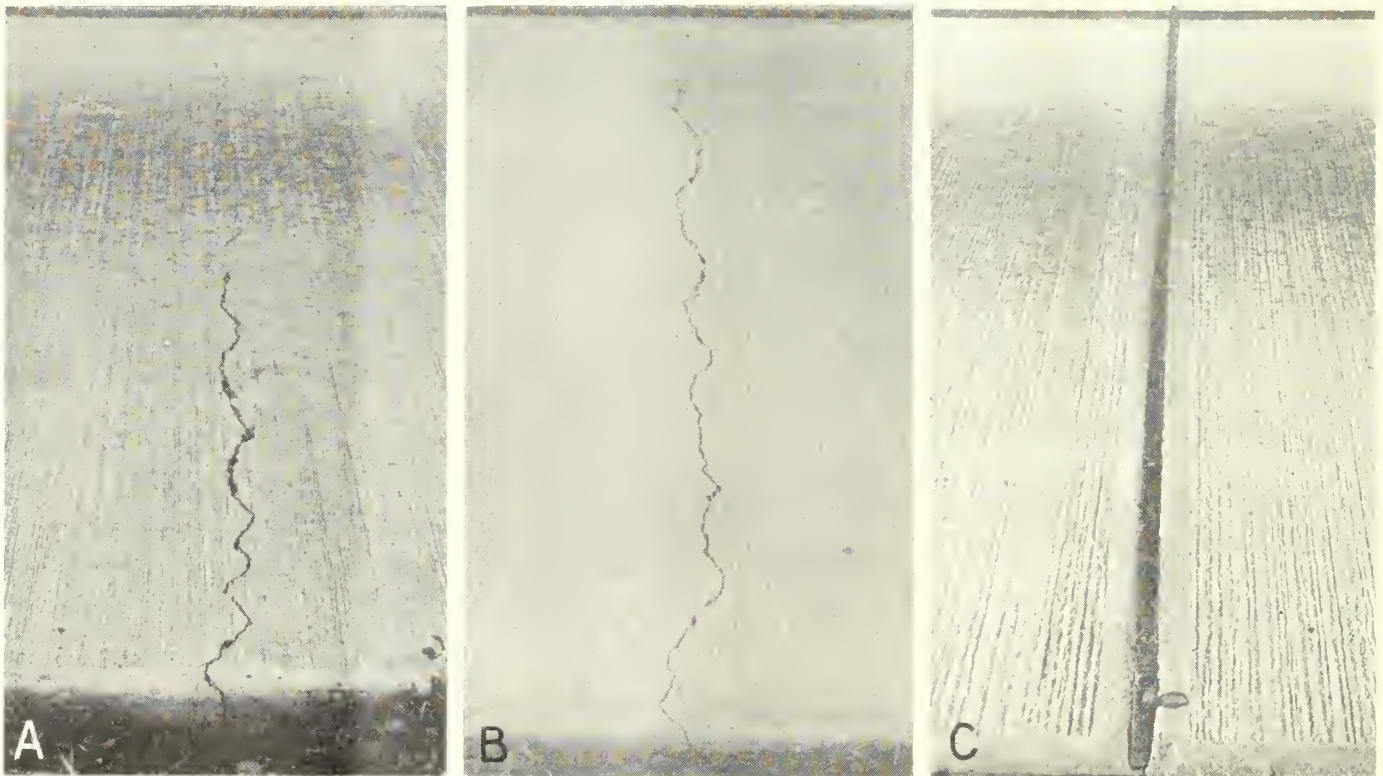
A, TYPICAL CRACK OVER SUBMERGED PARTING STRIP IN LANE CARRYING HEAVY TRAFFIC; B, TYPICAL CRACK OVER SUBMERGED PARTING STRIP IN LANE CARRYING LIGHT TRAFFIC; C, PRESENT CONDITION OF TYPICAL WEAKENED-PLANE JOINT WITH SURFACE GROOVE.
